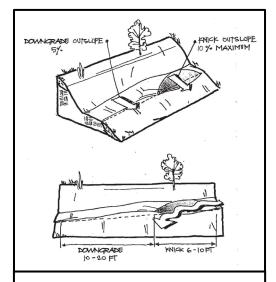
Typical Plan View and Cross Section for Rolling Grade Dip
